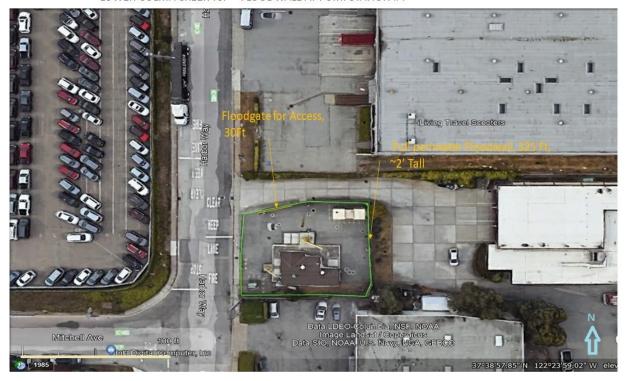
Tentatively Selected Plan (Alternative 2)
